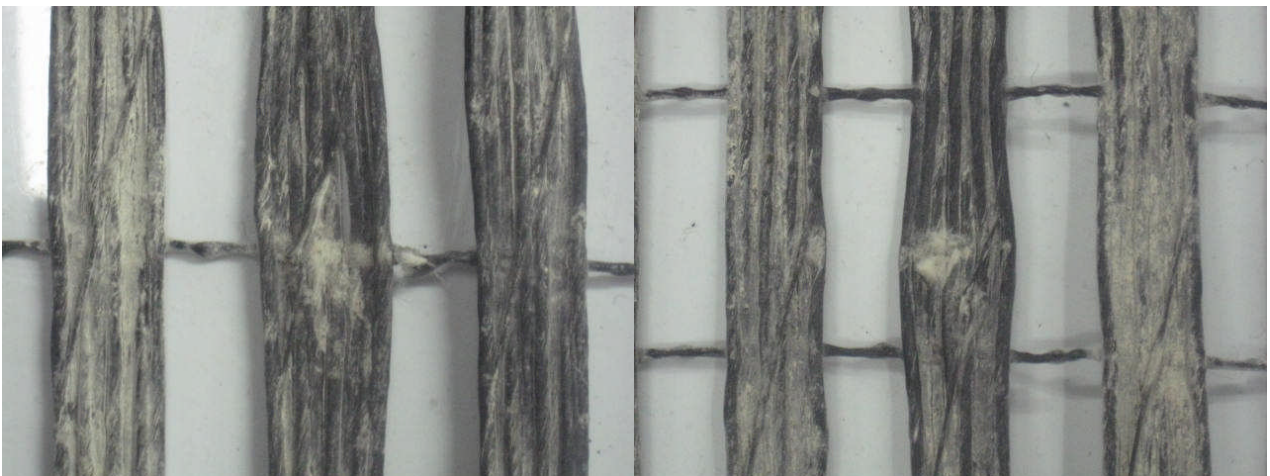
Photos of typical visual damage of 24XT installed in soil gradation 1.
